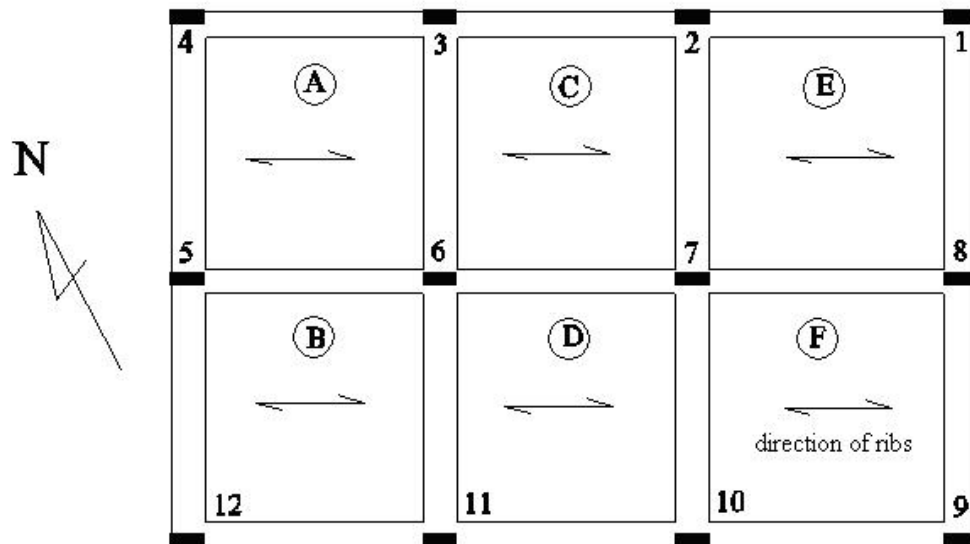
Slab Reinforcement Plan (Case 2-a).
